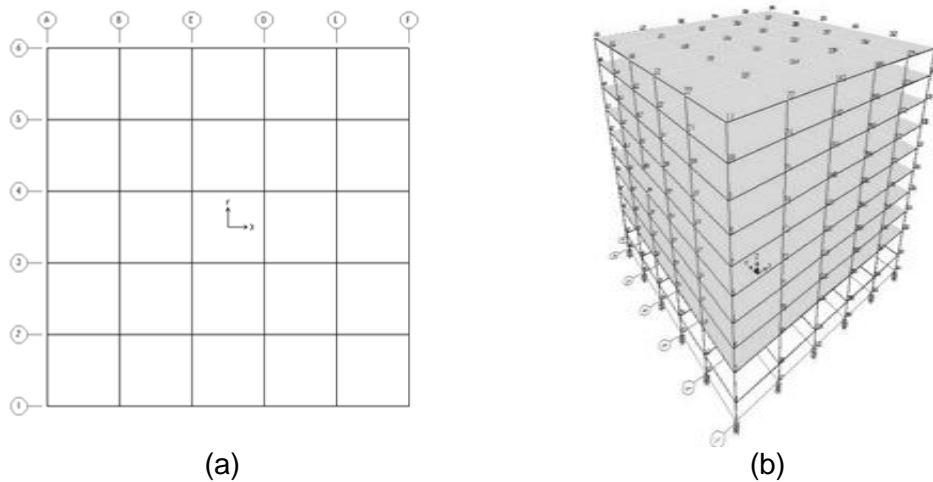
(a) Plan View of 9 Story SAC Frame & (b) 3D View of 9 Story SAC Frame
